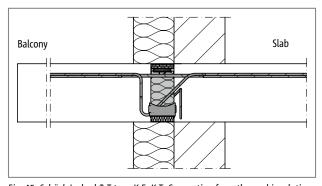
Schöck Isokorb® T type K-E, K-T: Connection for a thermal insulation bonded system WDVS
